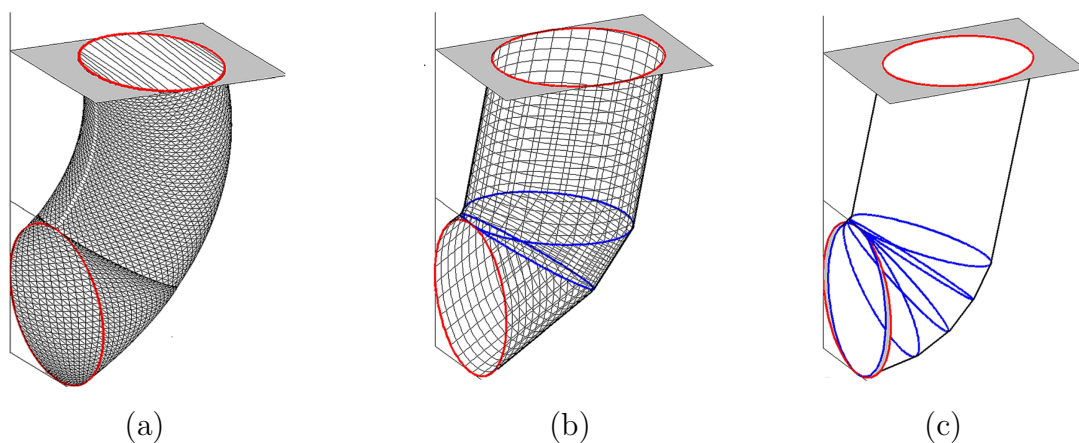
3D collapse mechanisms based on upper bound solution, Mollon et al. (2012): (a) two blocks failure mechanism; (b) three blocks failure mechanism; (c) five blocks failure mechanism
